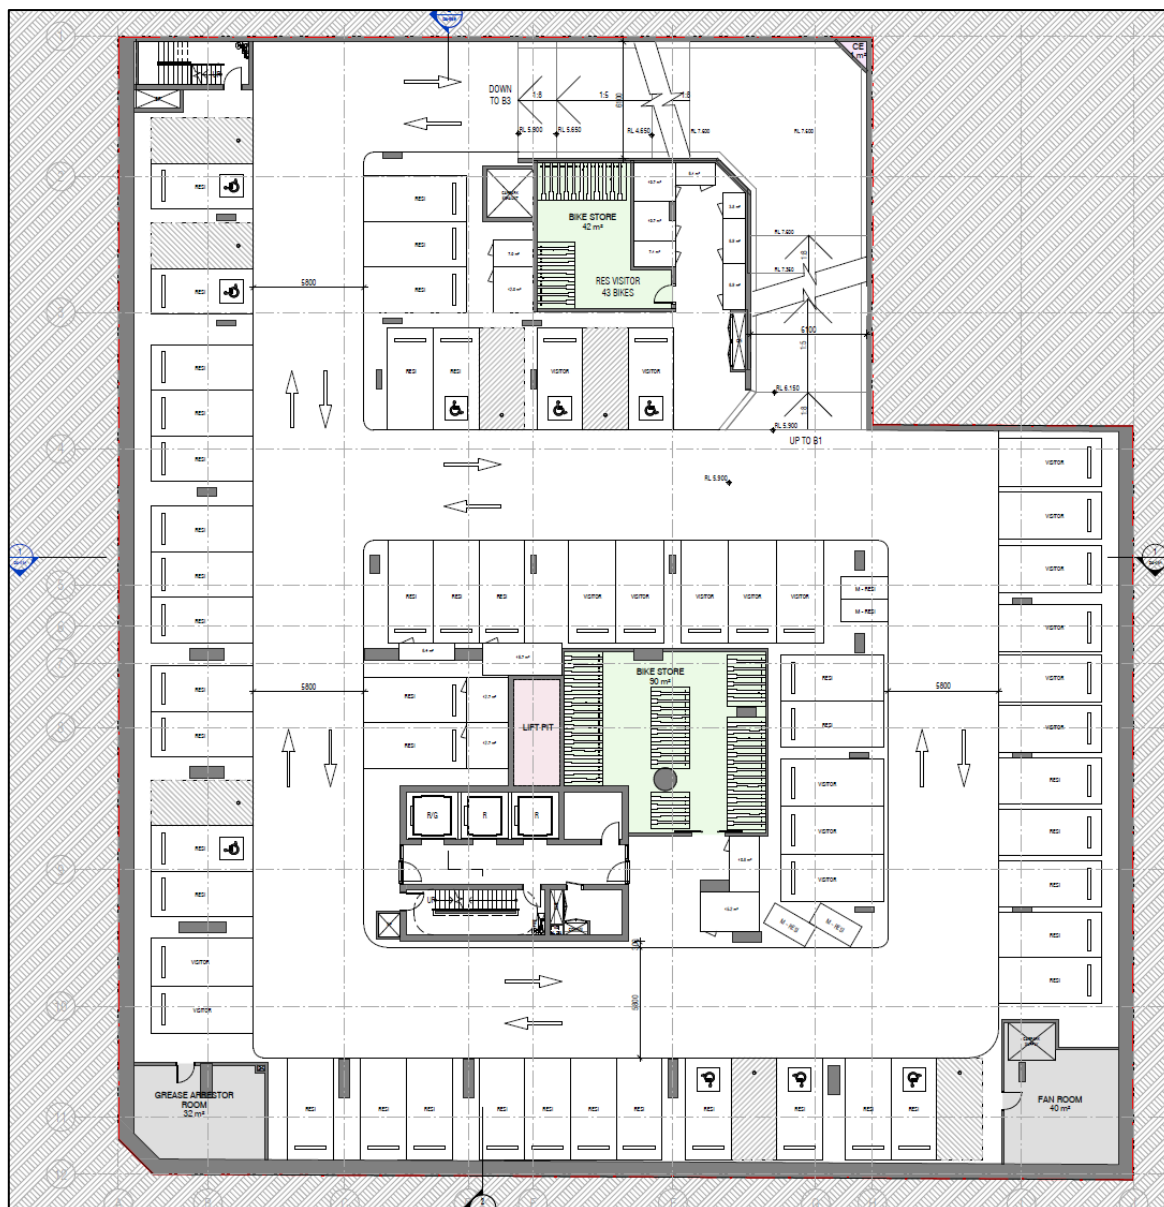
| Proposed Basement 02 (Source: Applicant's Architectural Plans Rev D dated 28 March 2024)
